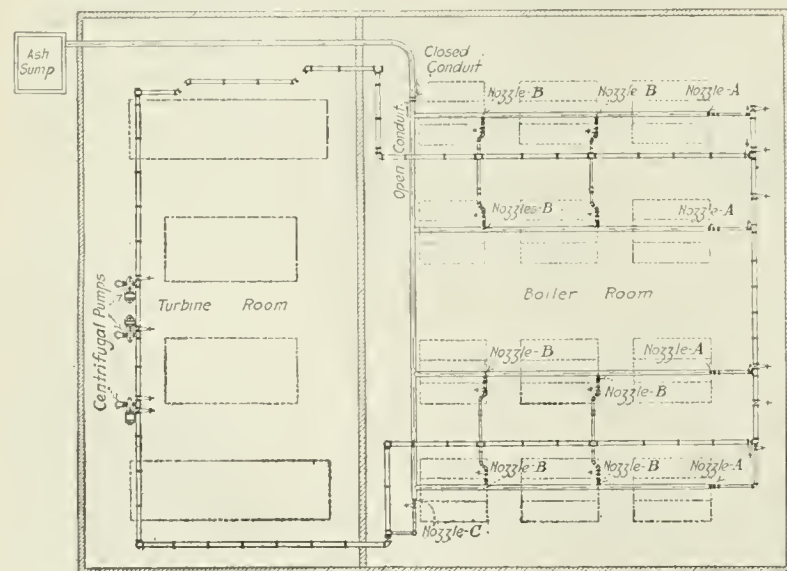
WATER CONVEYOR AT HELL GATE STATION. PLAN
